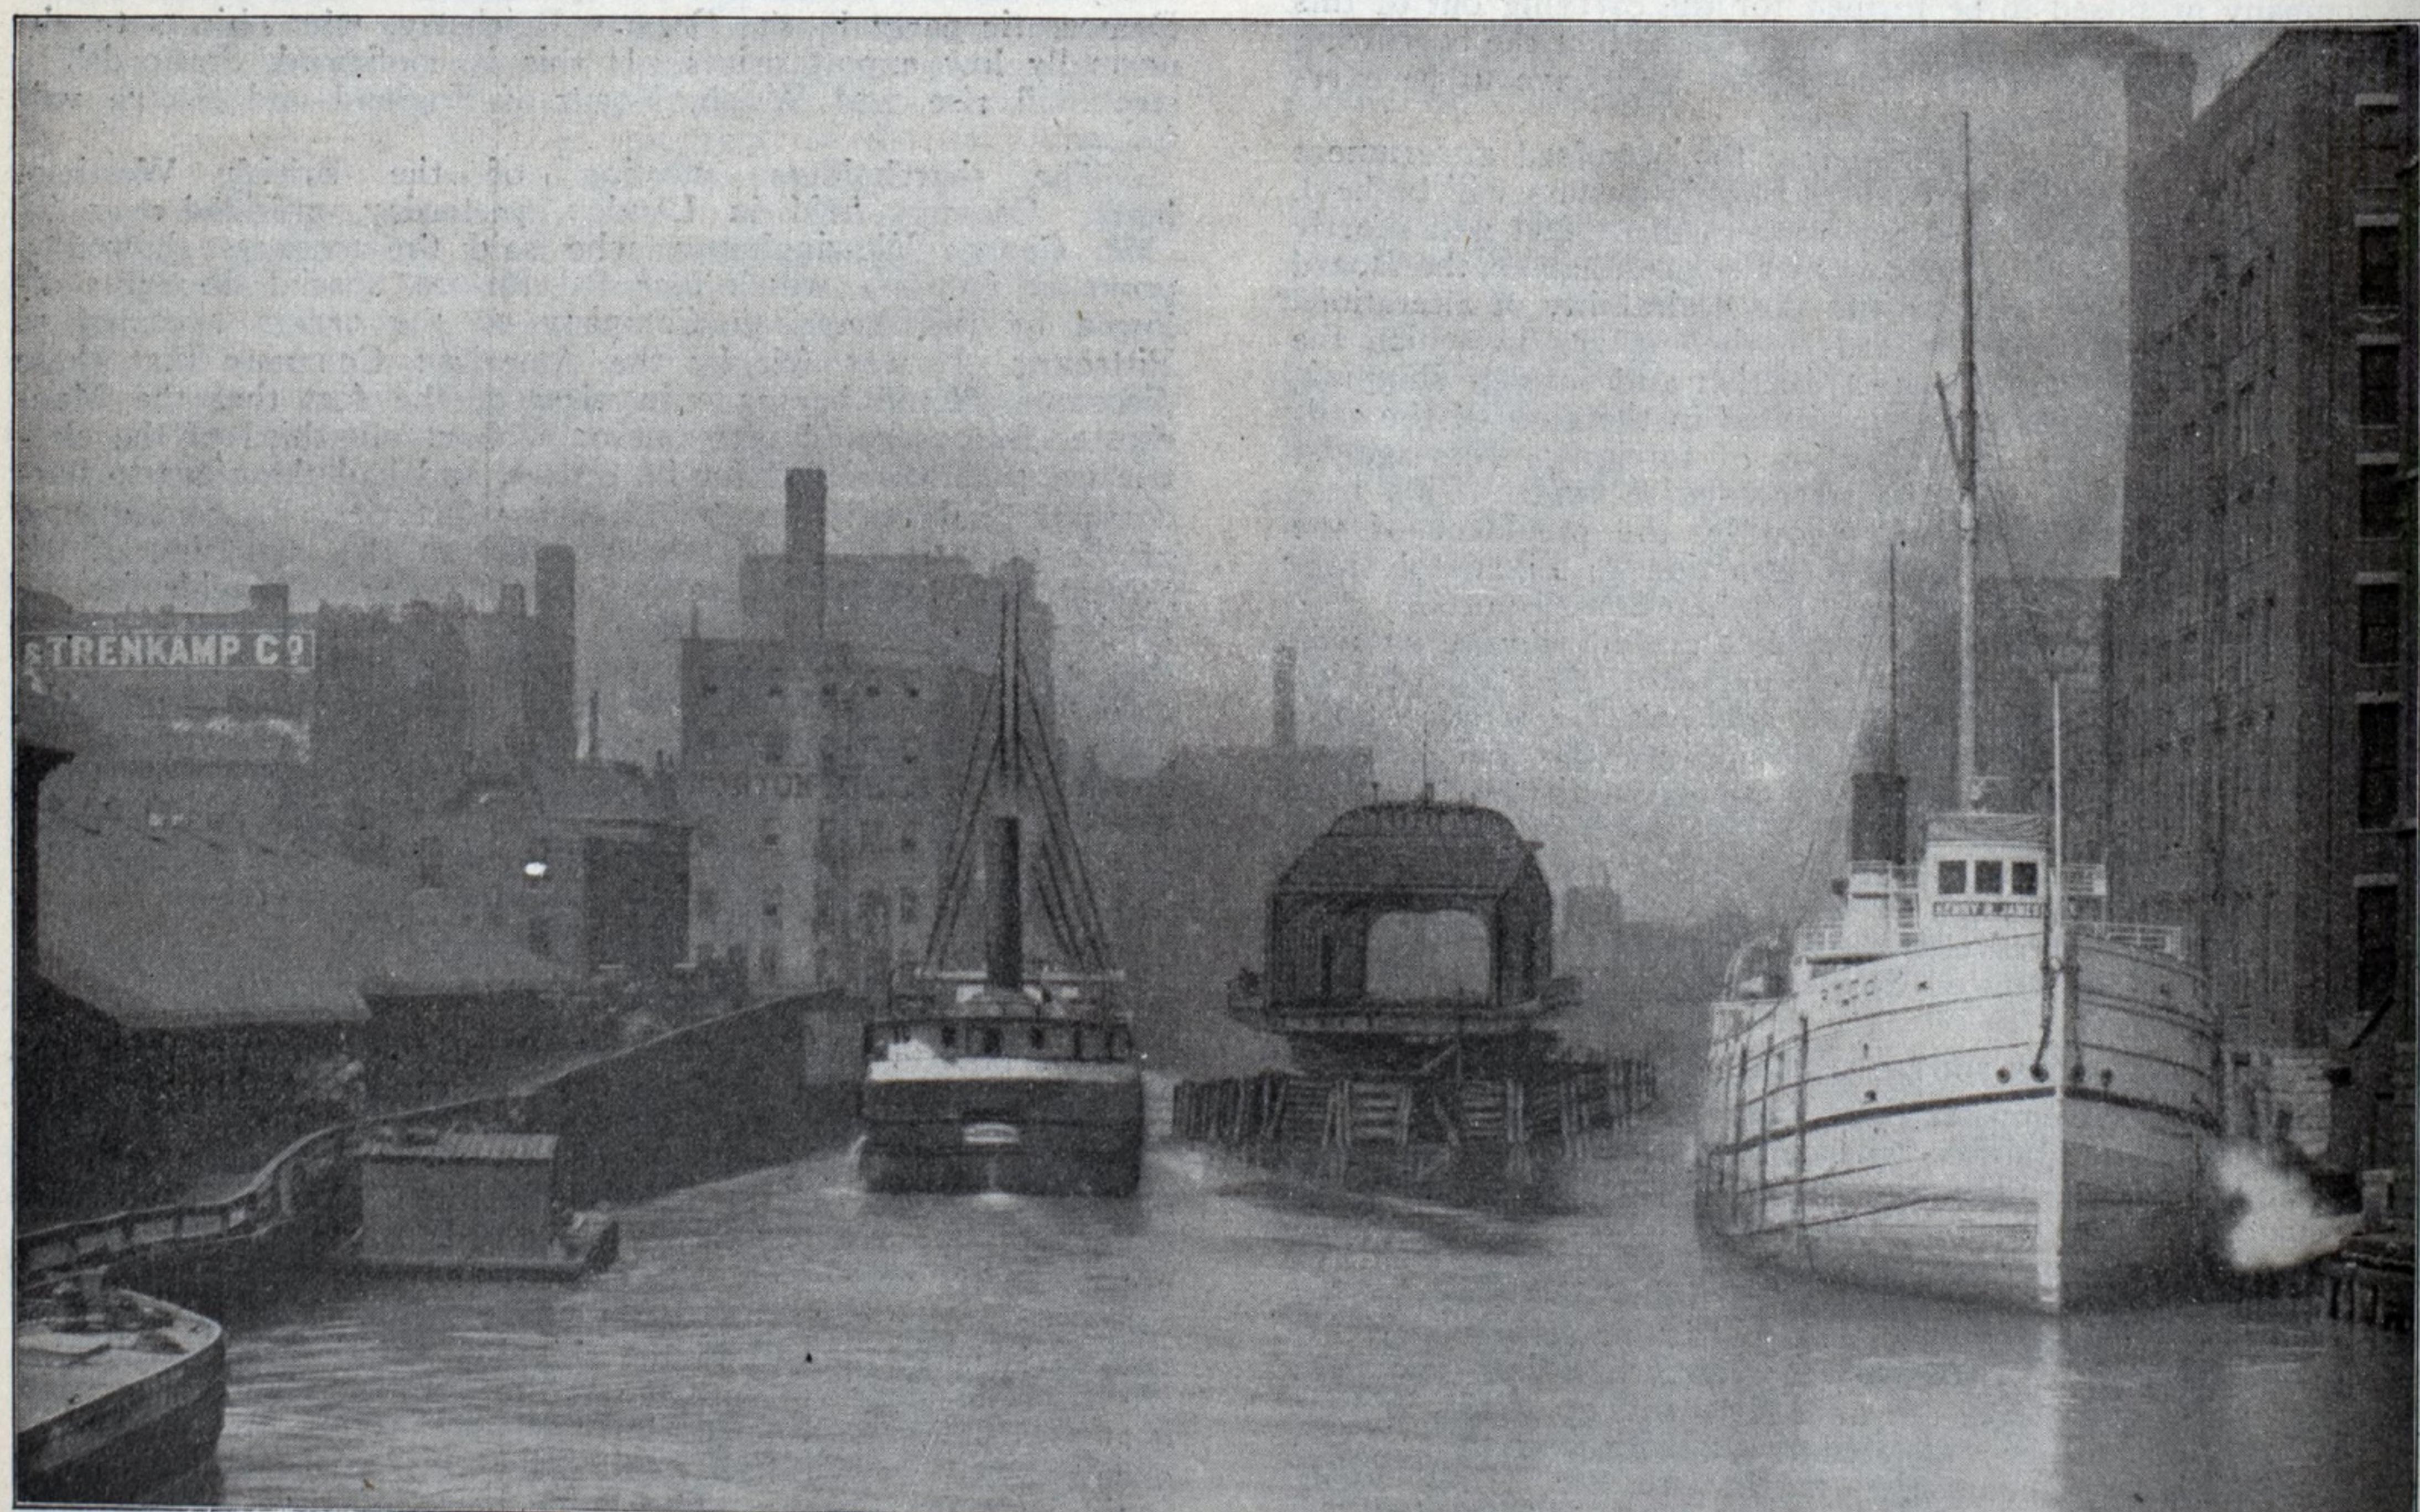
Obsolete Center Pier Swing Bridge Obstructing Navigation.
